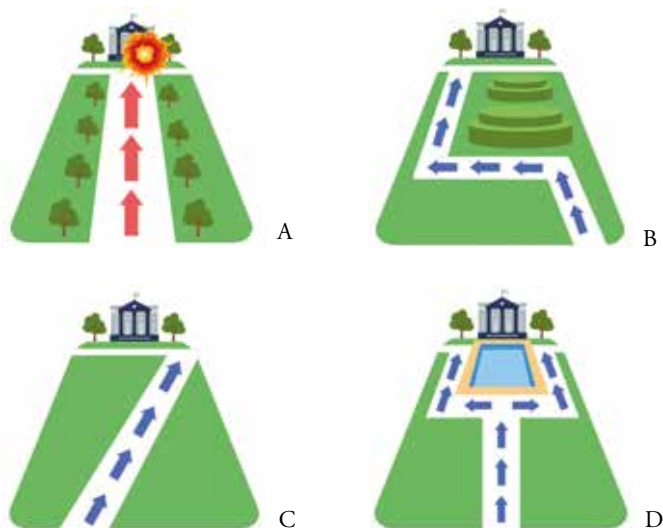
Preventing VAW attacks through access road design. Access road runs straight ahead (A), twisting access road and natural obstacles placed on the axis of the road (B), offsetting the access road in a ‘diagonal’ position (C), placing an obstacle, such as a body of water, on the axis of the access road (D).
